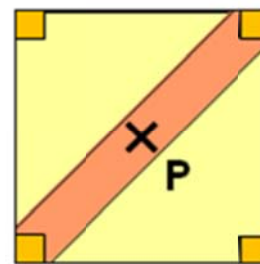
Slab Panel on Corner Columns Subjected to a Central Point Load
